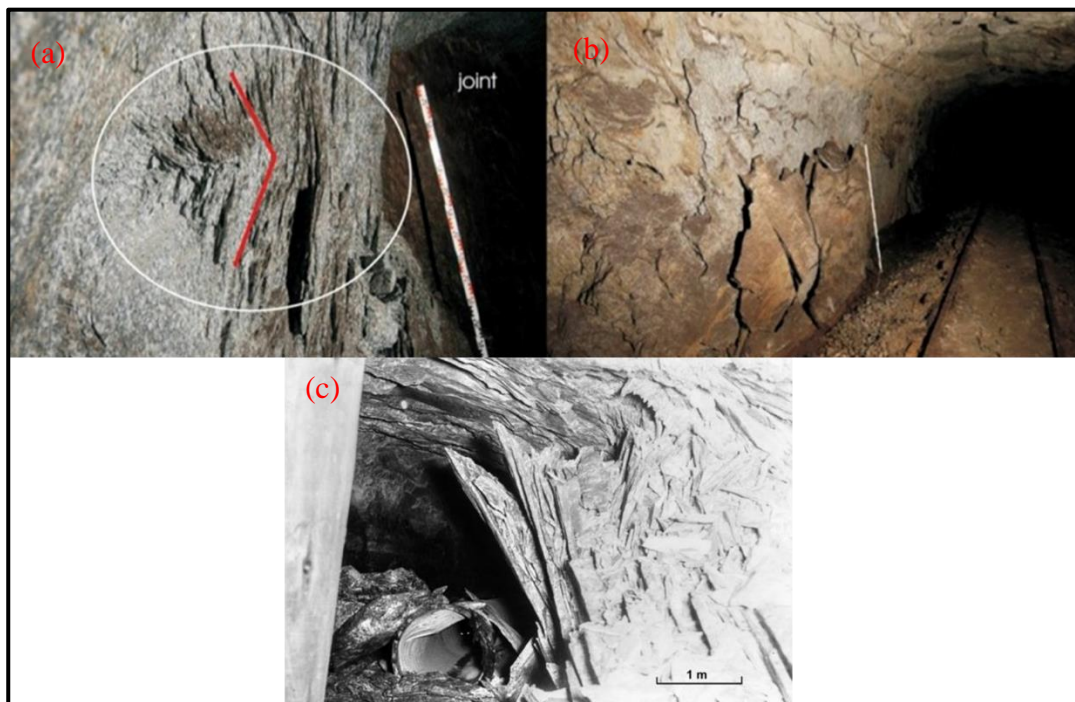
Bedretto Adit spalling failure, V-shaped notch tip (a), spalling along full tunnel face (b) (Huber, 2004); Rock burst in a deep South African Gold Mine (c) (Hoek & Martin, 2014)
